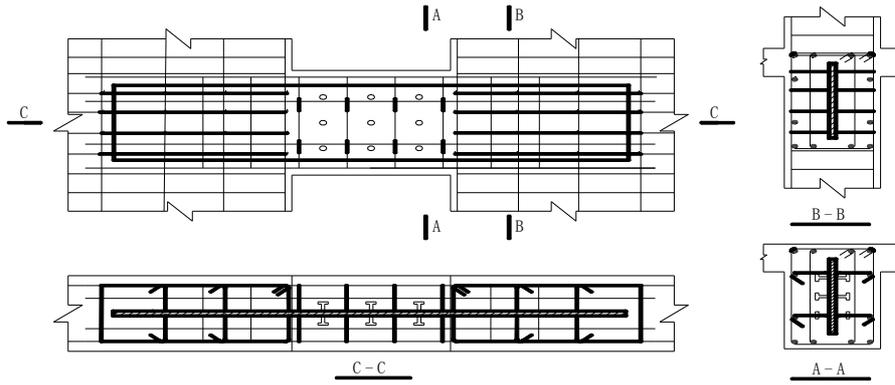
Schema of steel plate with semi-opened welded stirrup
